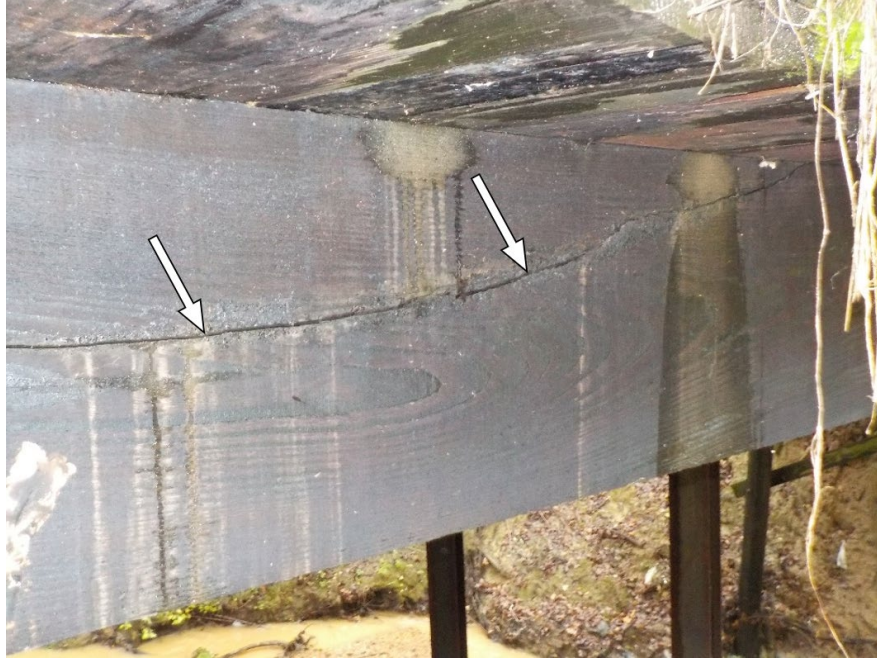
Horizontal Shear Crack in a Timber Beam
